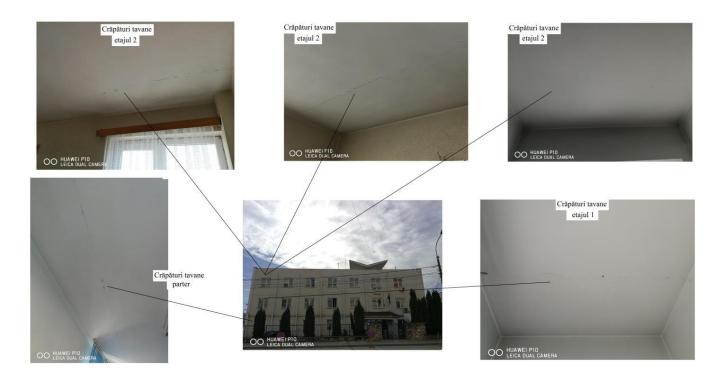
The floor is cracked in several areas of the building and there is a risk of collapsing
